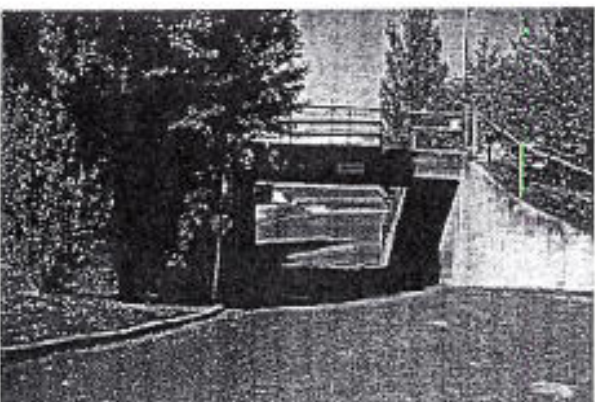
Access to the North Shore Recreation Area under the NOAA entry road
